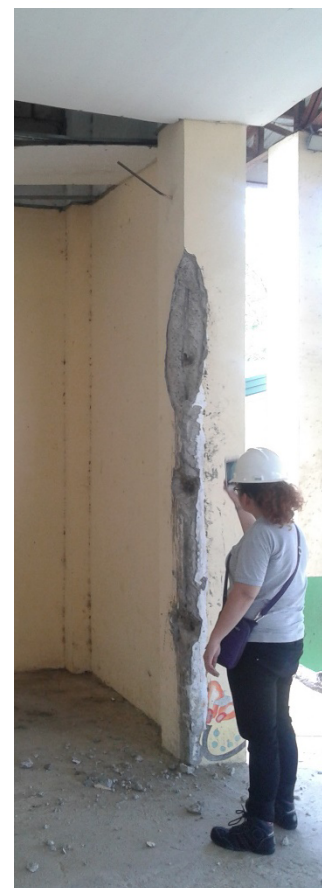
Shear failure of reinforced concrete columns and parapet failure – mall complex/shopping center.
